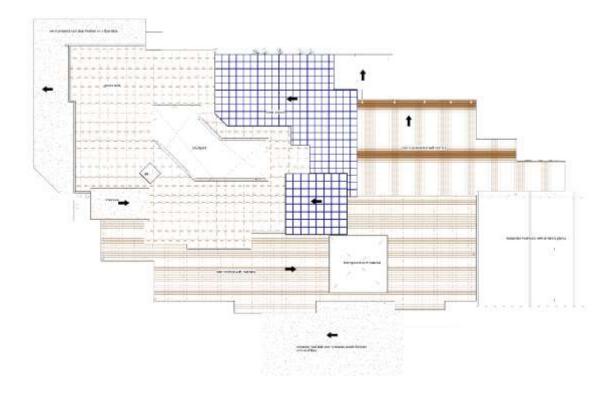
Proposed roof plan for office complex Source: Authors' design (2020)
